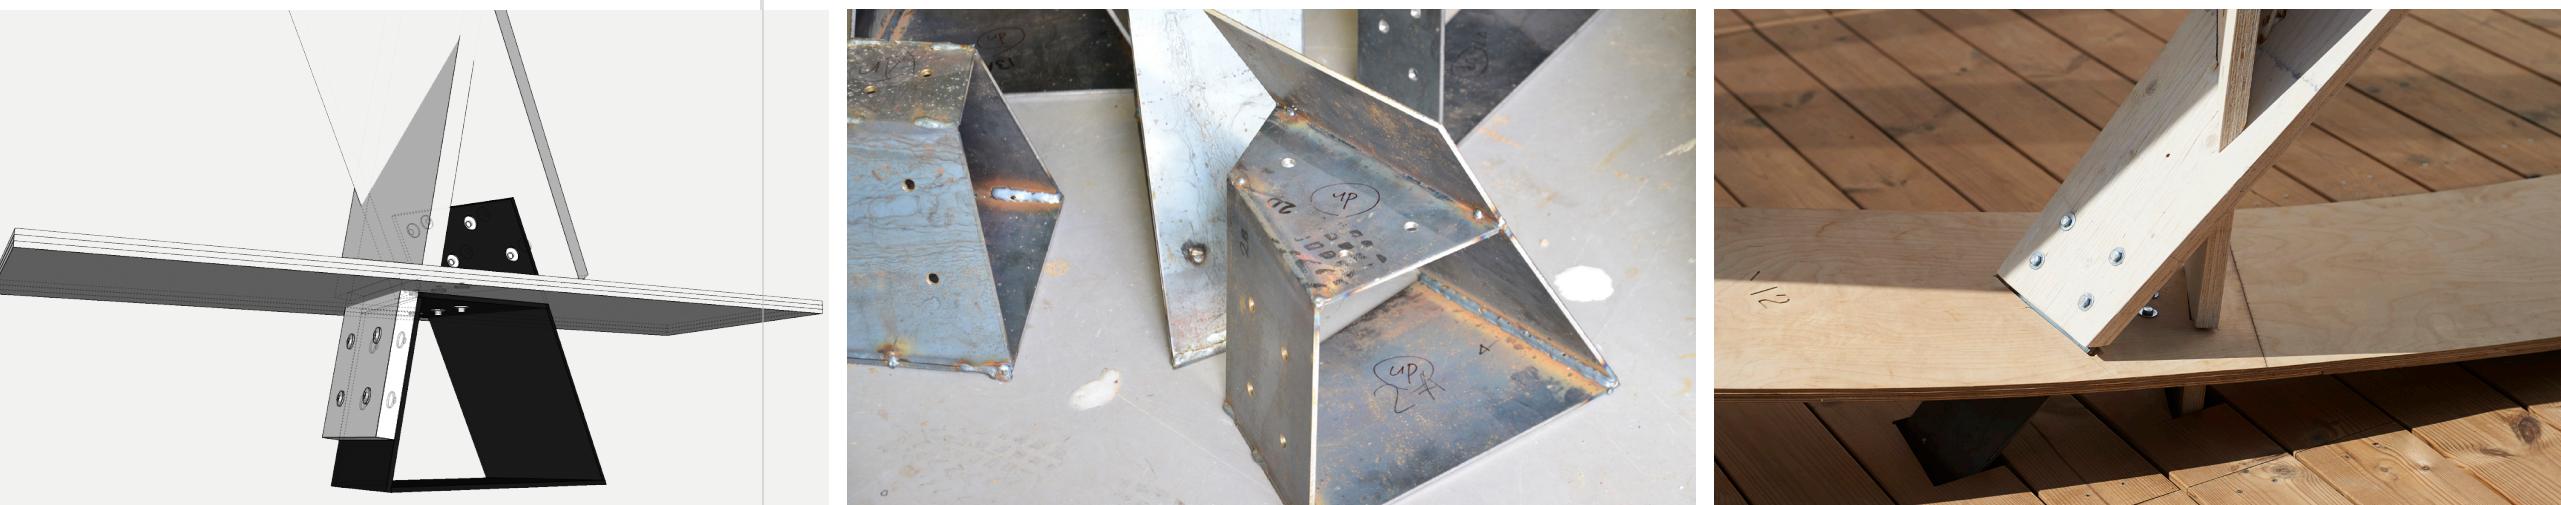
Metal plate footing provides the stability and weave the structure into the ground
